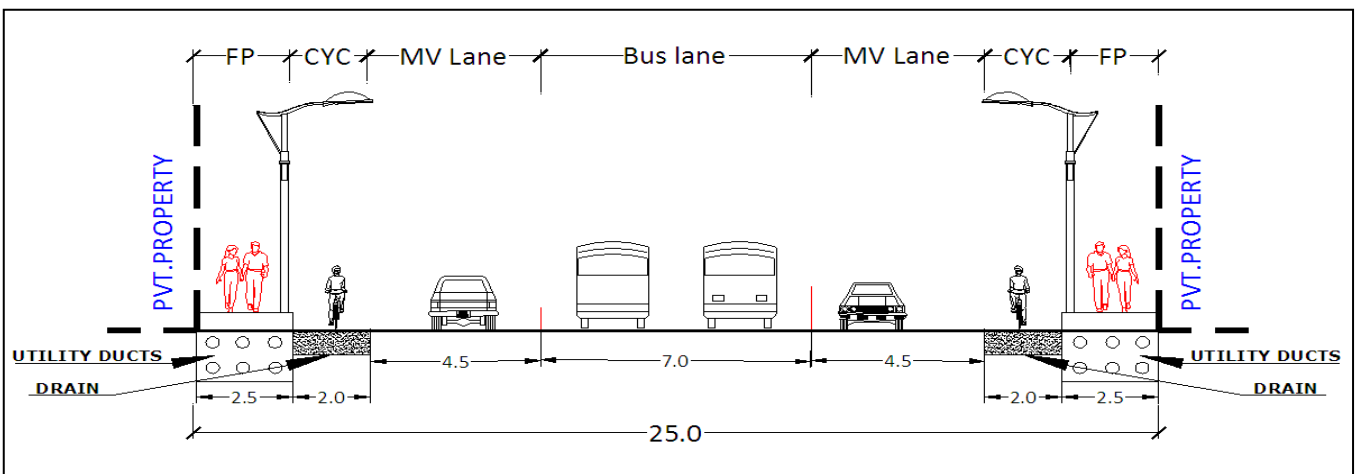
Collector road with centre bus lane cross- section- (RoW- 25m)
